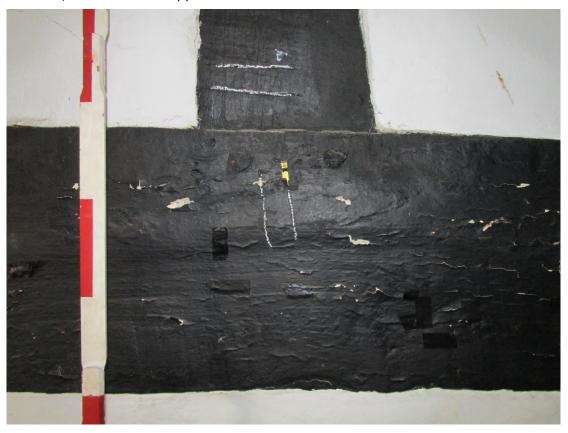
; Carpenter's numbers on tie-beam and post of south wall
